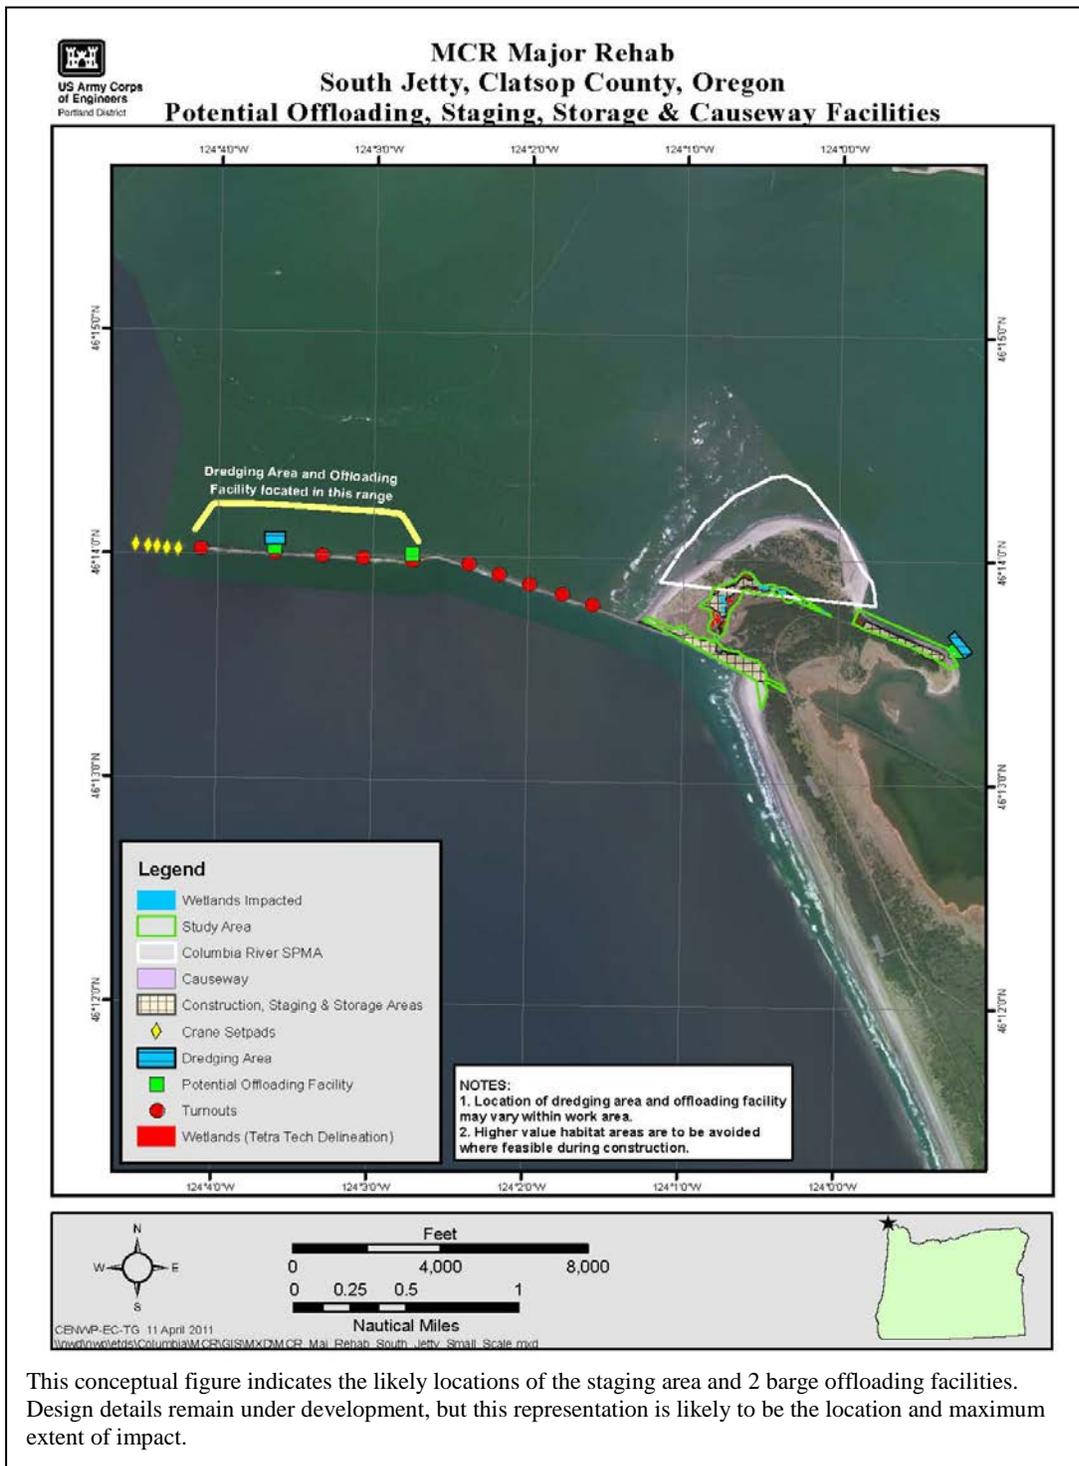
South Jetty Conceptual Staging and Offloading Facility Locations
